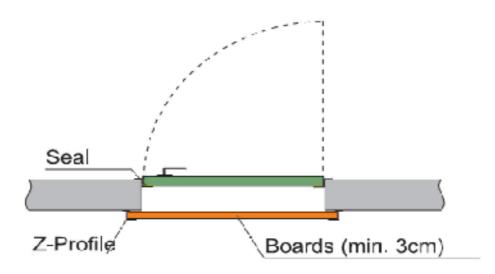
Pellet Silo access door with effective Z-profile sealing and board protection
